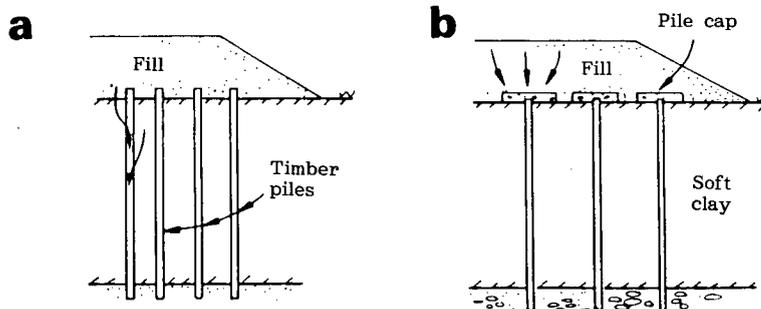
Embankment piles (a) without pile caps and (b) with pile caps (52).
